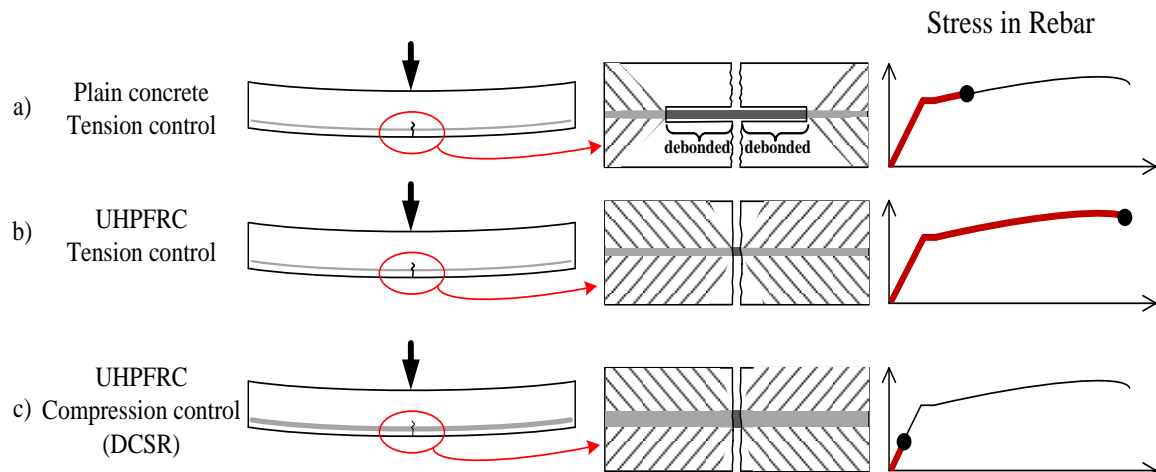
Stress in steel reinforcement adjacent to a cracked section in: a) RC, b) SFRC and c) UHP-FRC
